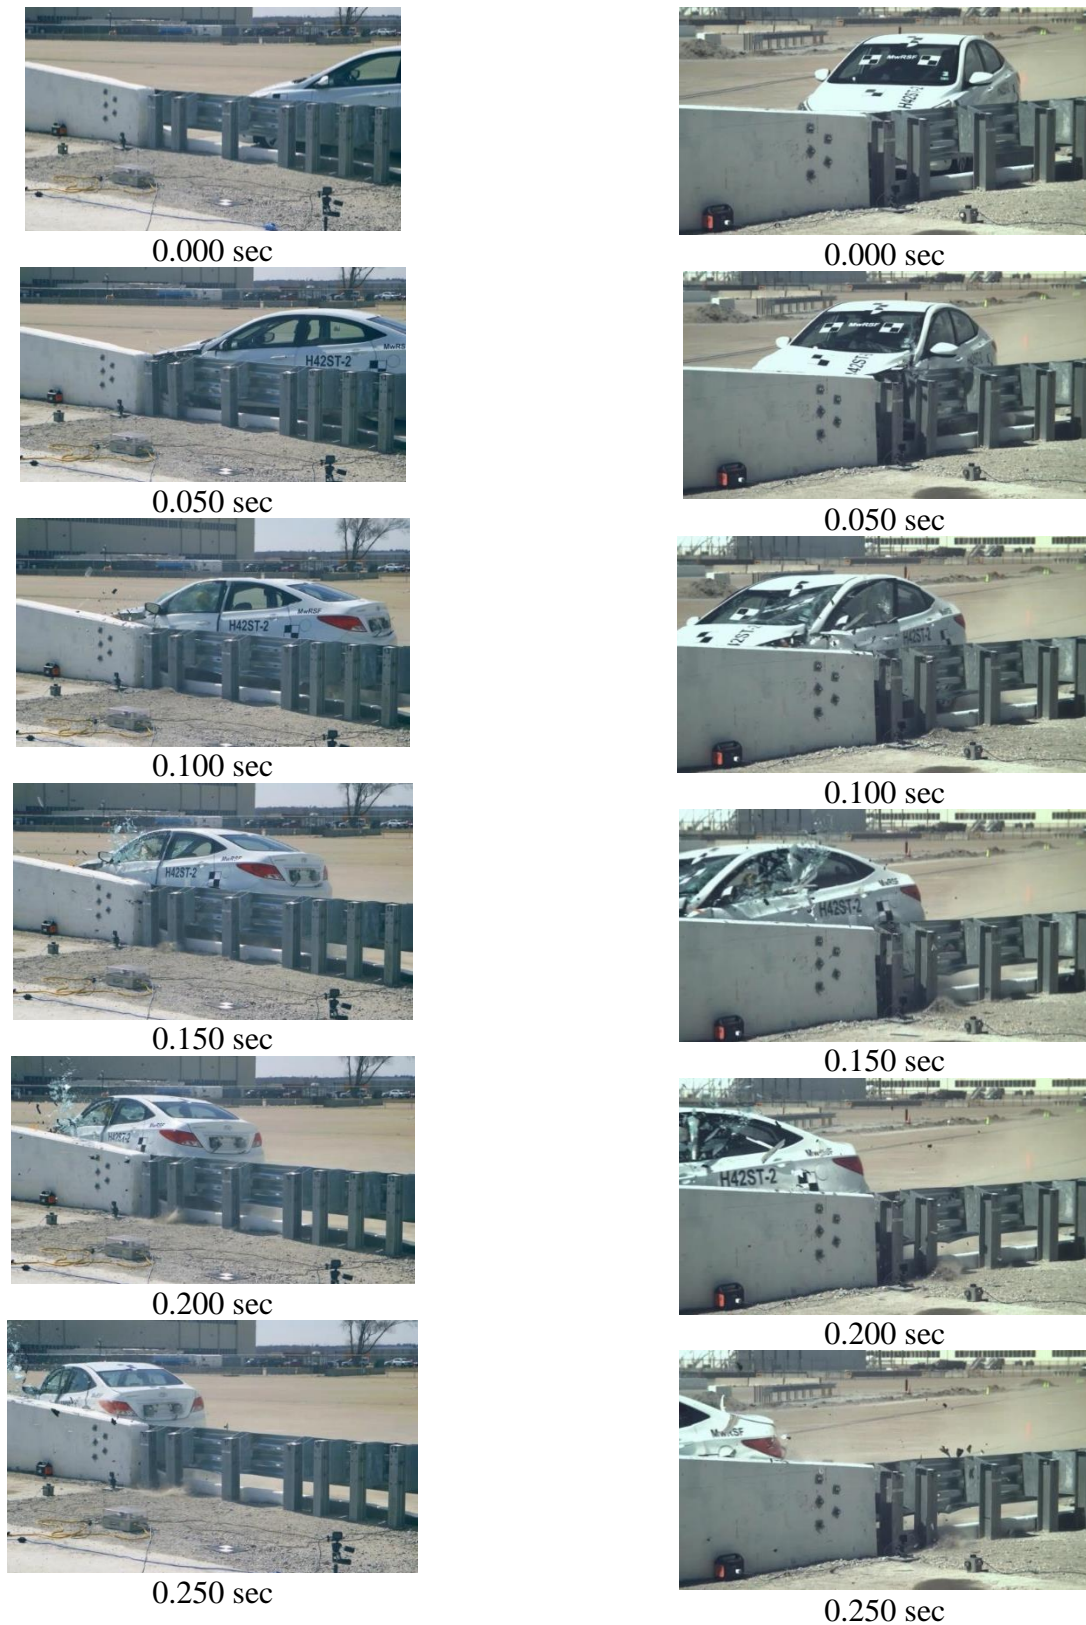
Additional Sequential Photographs, Test No. H42ST-2
